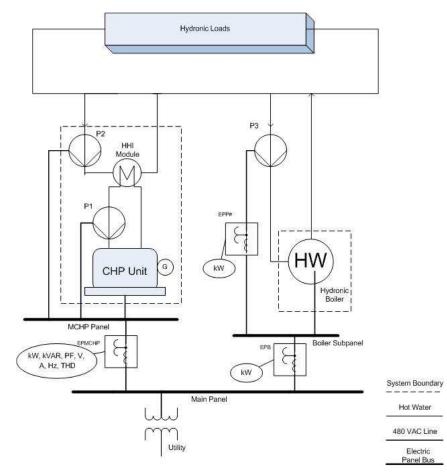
Electrical One-Line Drawing with Simplified Mechanical
